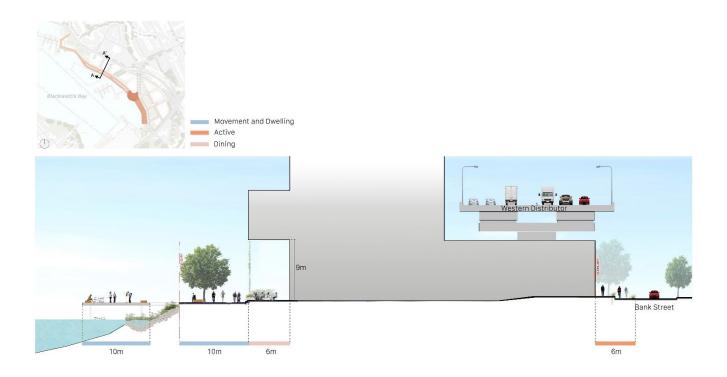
Section showing foreshore promenade adjacent to private landowner sites and Bank St
